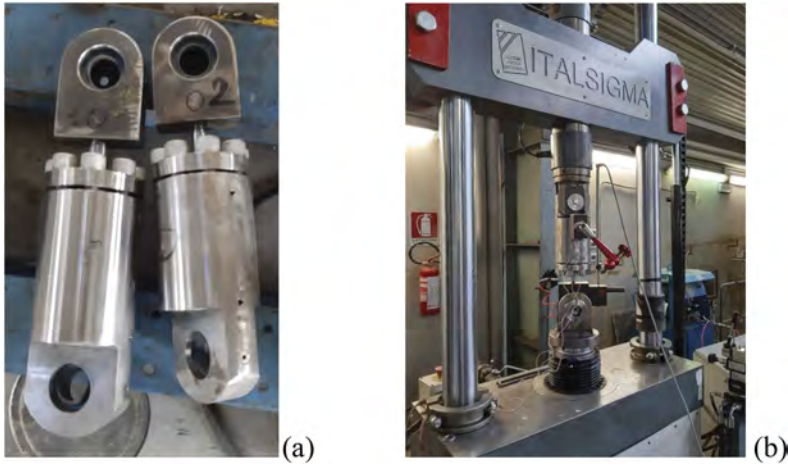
Picture of the tested PS-LED prototypes (a); test configuration showing one prototype on the testing machina (b).
